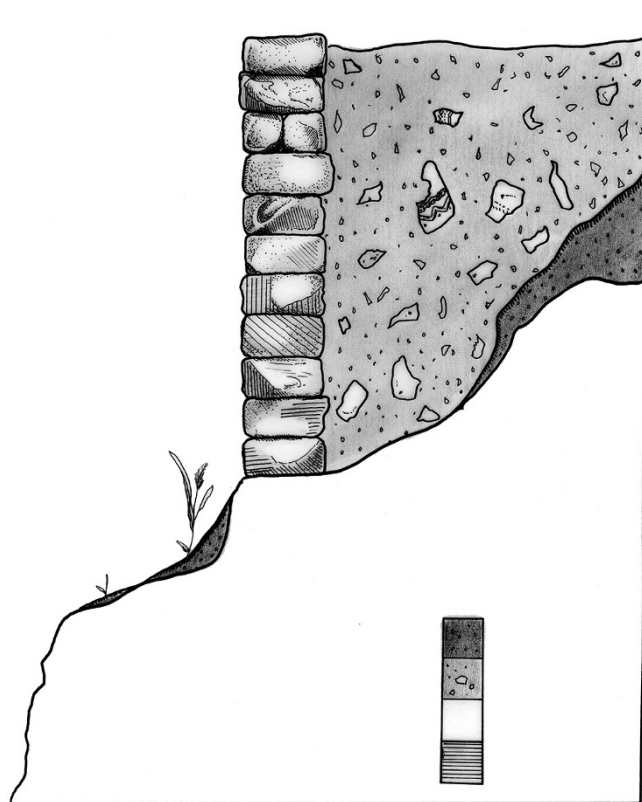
Agger or terrace wall, section view. *Source:* S. Huisbrink, used with permission.
